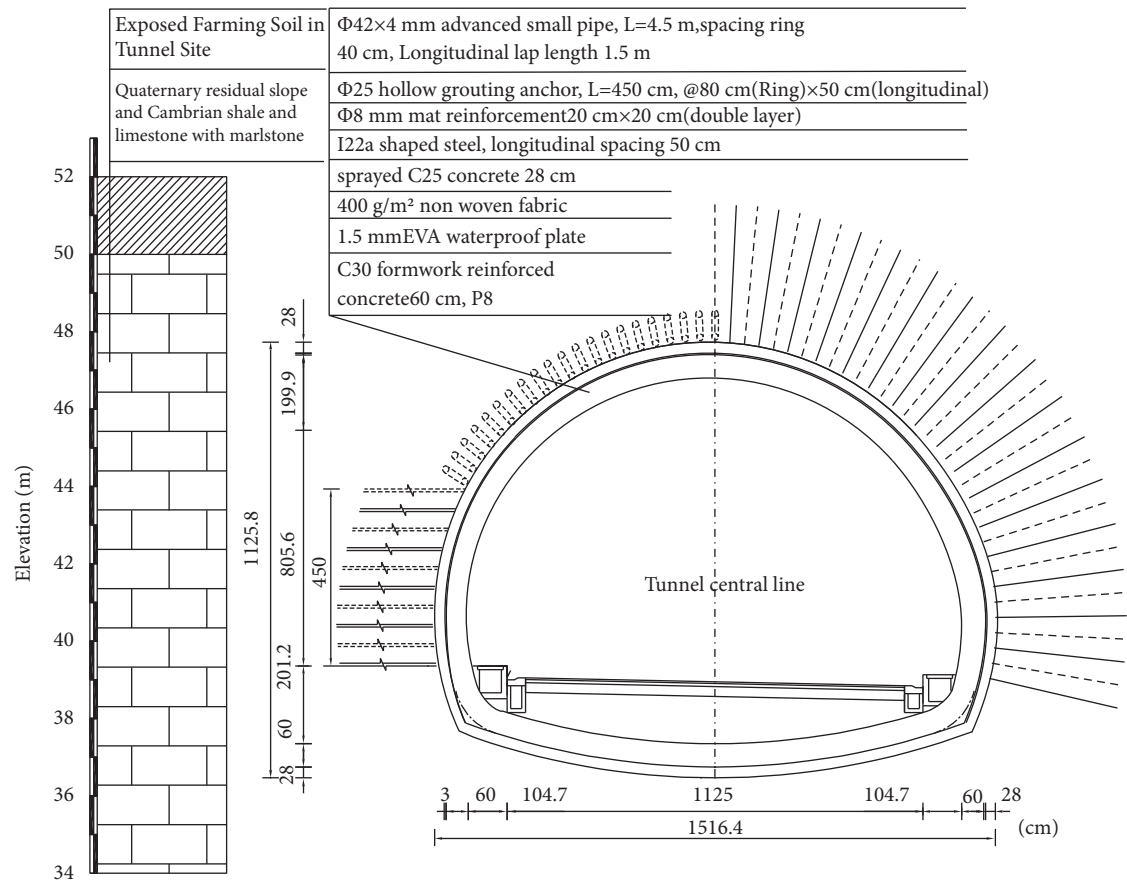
Geological conditions of tunnel site and section map of tunnel design.
